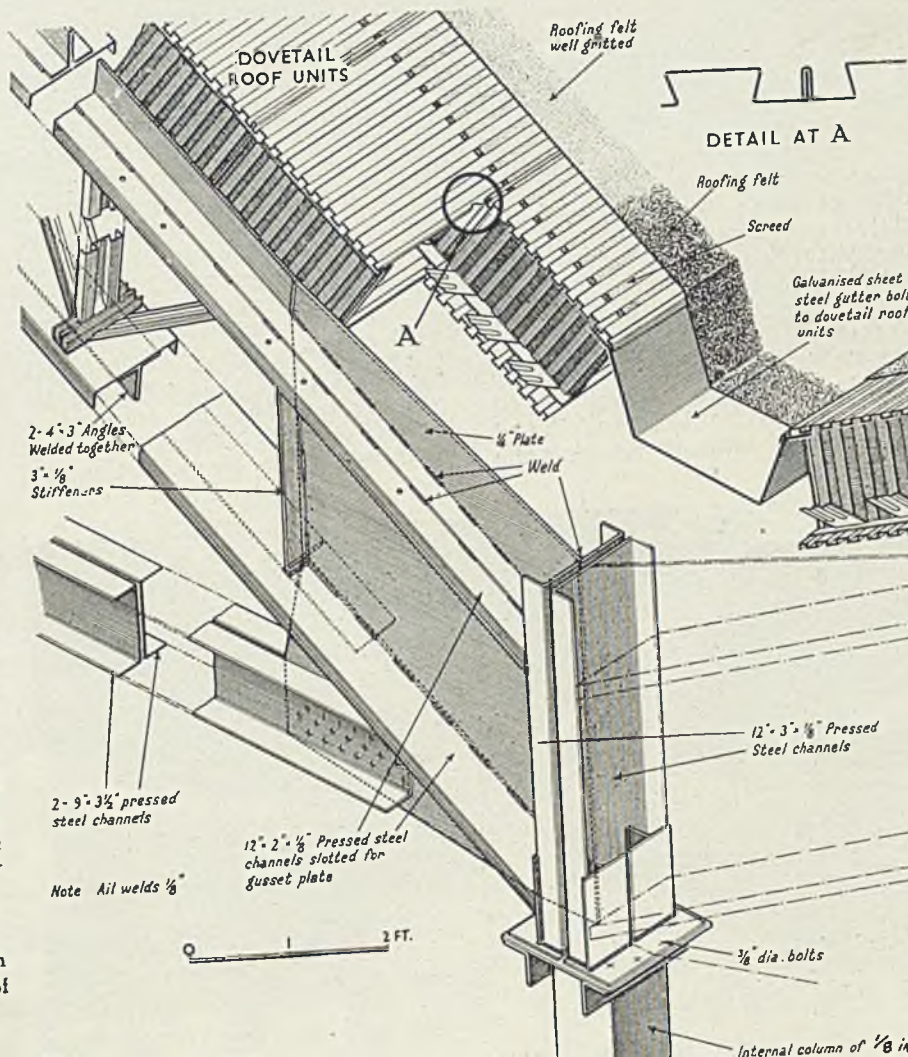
Isometric view of heel of arch truss showing construction details of roof and column also
